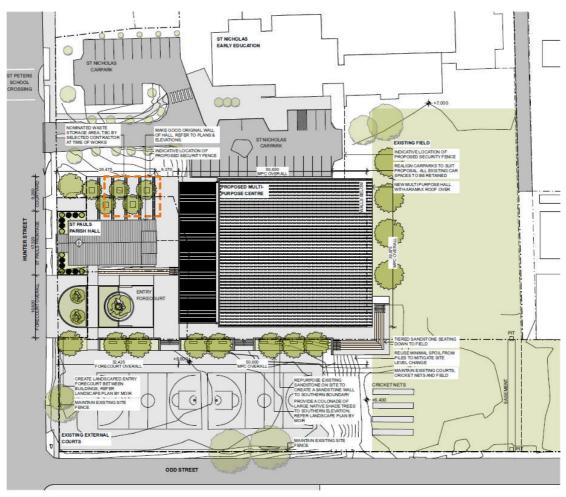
Site plan showing the total development of Hall restoration and new MPC. (SHAC Sheet 1302)
